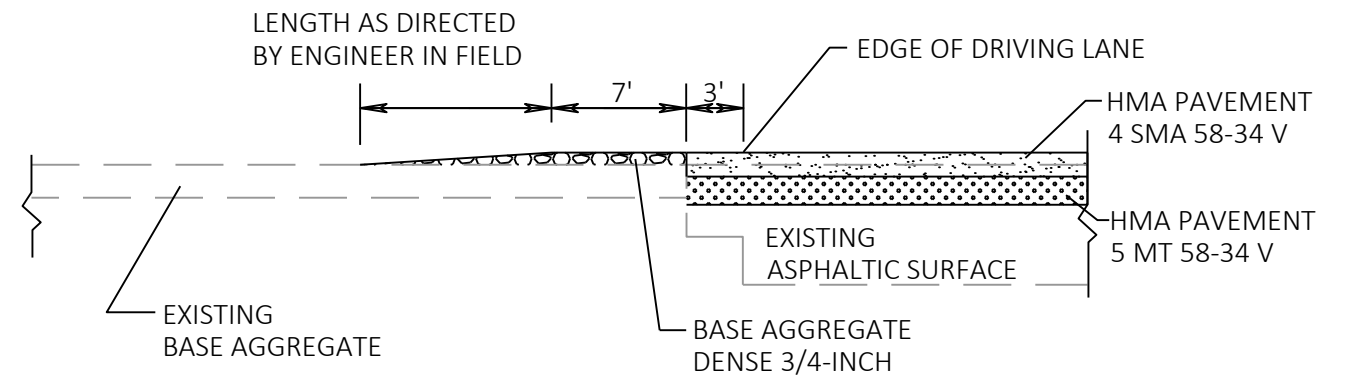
DETAIL FOR INTERSECTION CONSTRUCTION JOINT
